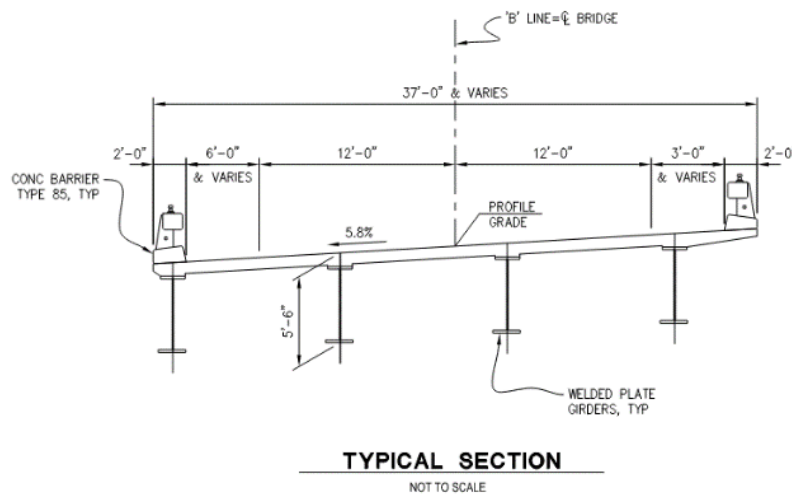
Proposed Project Typical Bridge Cross Section
